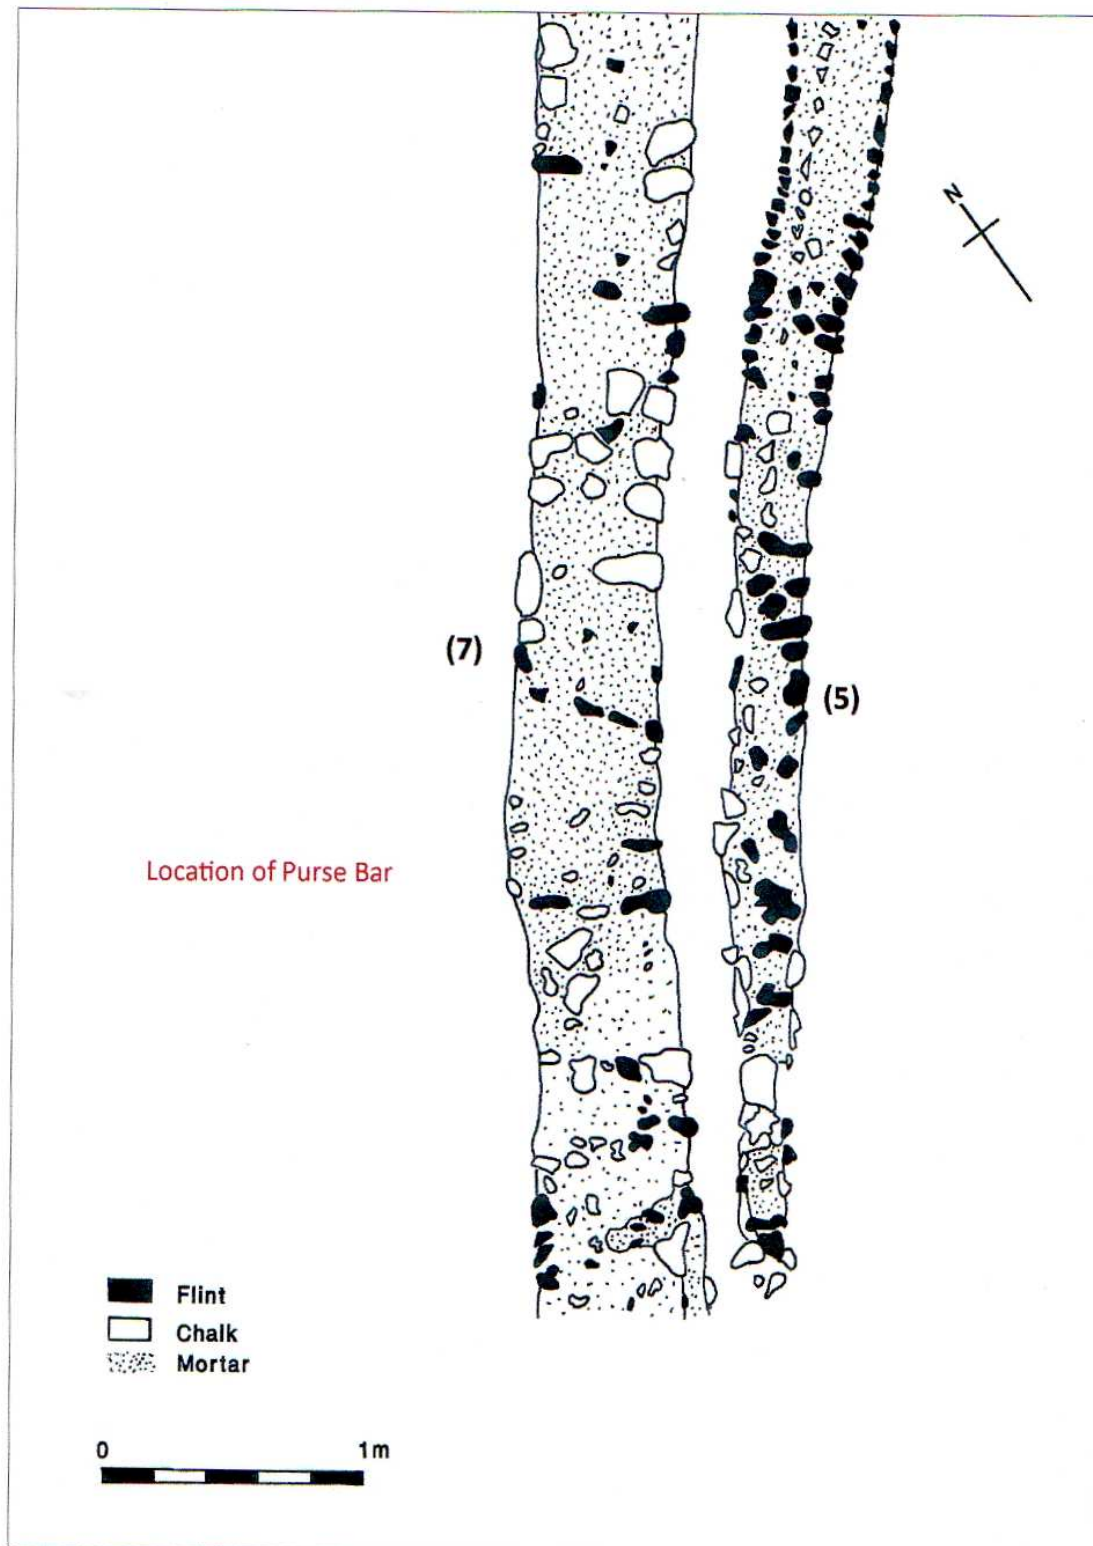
North-east corner of relationship of buildings and junction of boundary wall (D)
